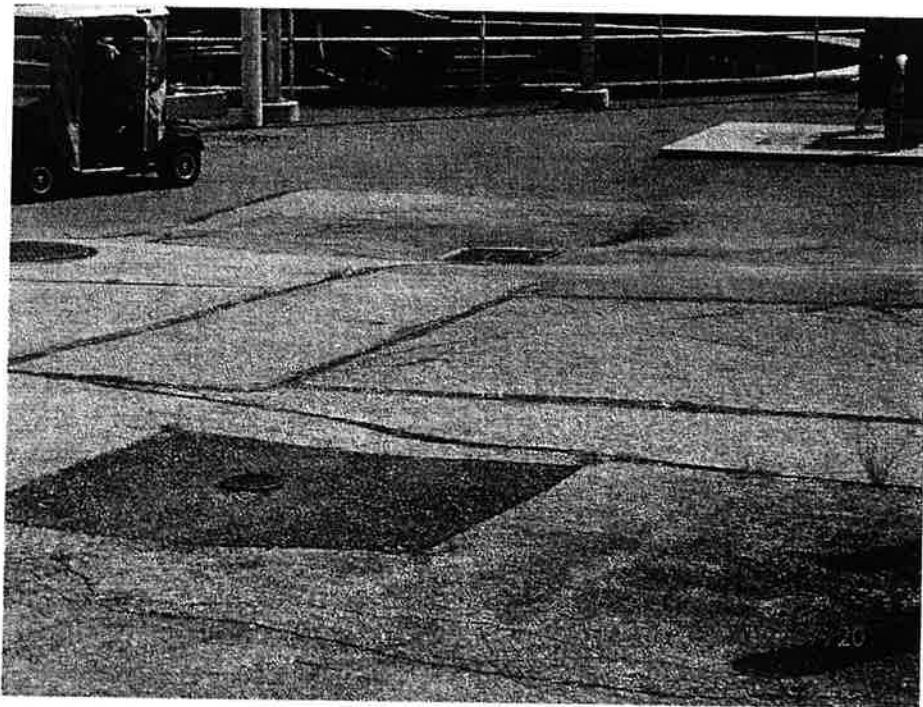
Photo by Kevin Buss, Paved area between the solids handling building and storm drain. Centrate discharge flowed from solids handling building to the storm drain in center of photo. Train #2 final clarifiers at top of photo.
